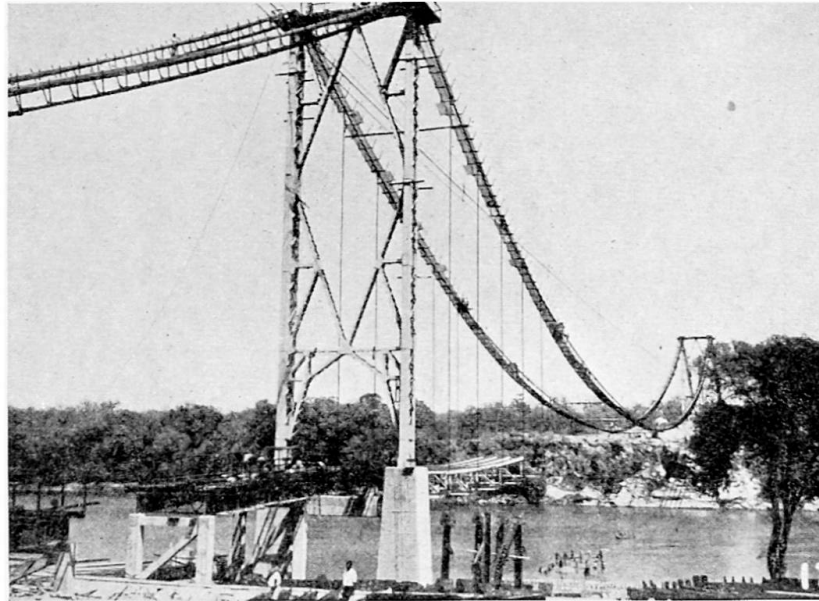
Otto Beit Bridge, Rhodesia. Erection of deck cross girders. Note opening in tower bracing for Blondin on Bridge centre line
